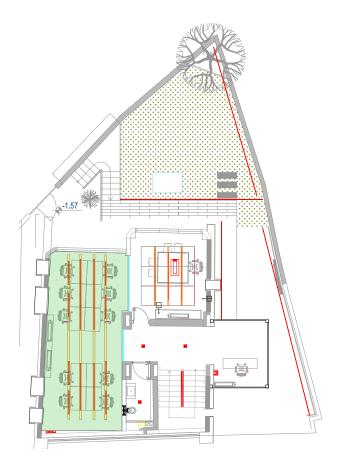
The ERKE Desing Open Office, Ground Floor Layout
